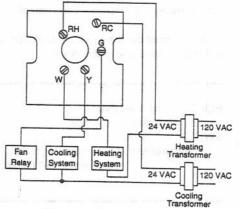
Typical 5-wire (Two-transformer) Heat/Cool Wiring
